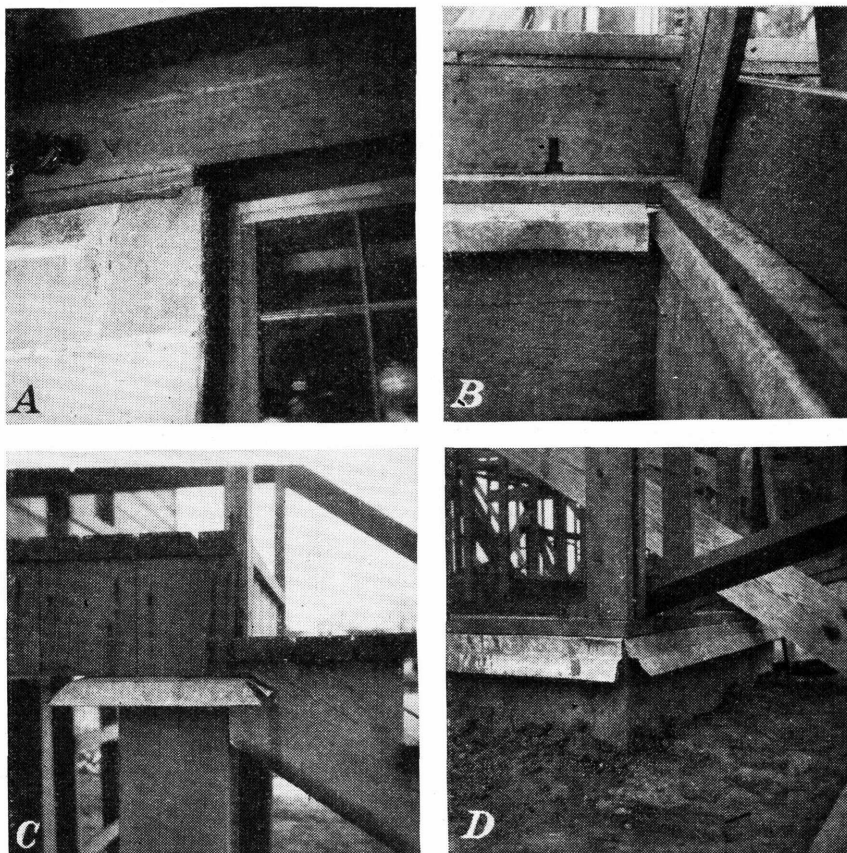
Improper methods of shielding. *A*, Shield not continuous over window, permitting attack through frame to sill; *B*, joint left open at corner, permitting termite passage; *C*, poor soldering, which allowed joint to open in handling; lack of clearance from wood around edge of shield nullifies shield's effectiveness; *D*, open joint at corner.
